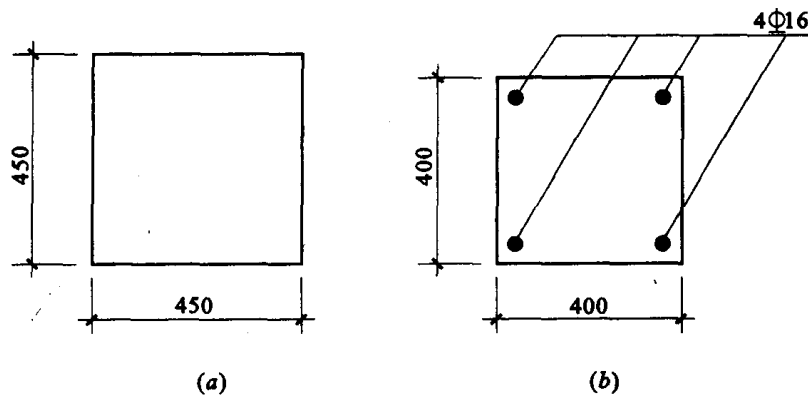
A comparison of concrete column with reinforced concrete column
